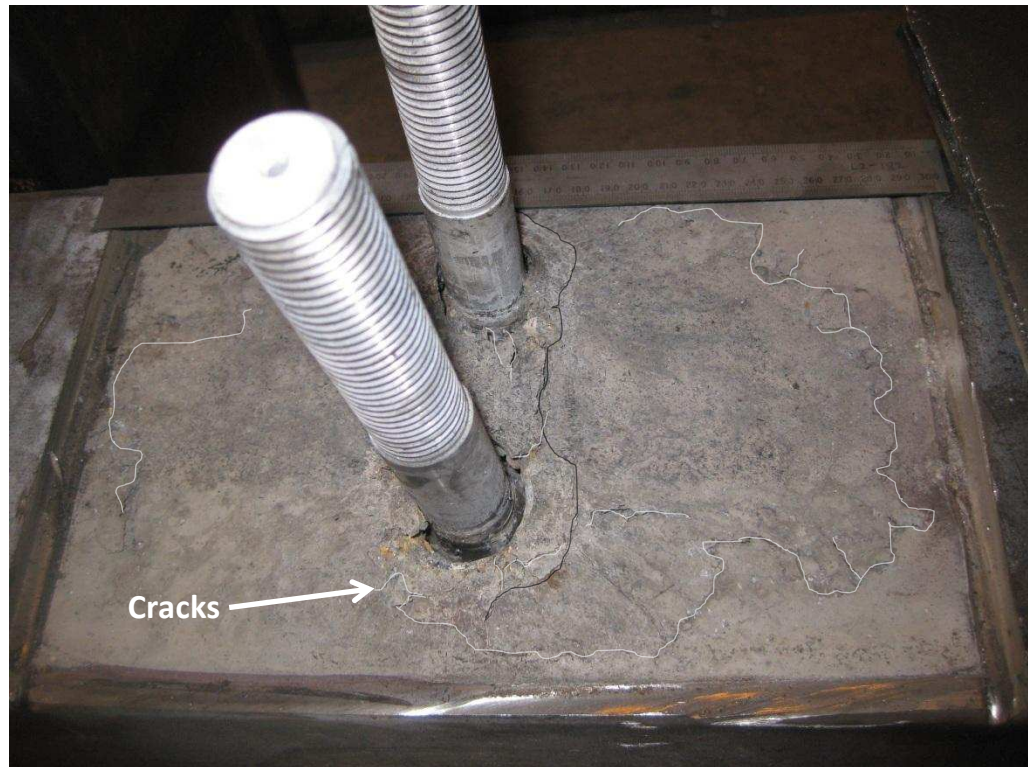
Sample b200t8g80C40-2 after the concrete-infill was exposed
